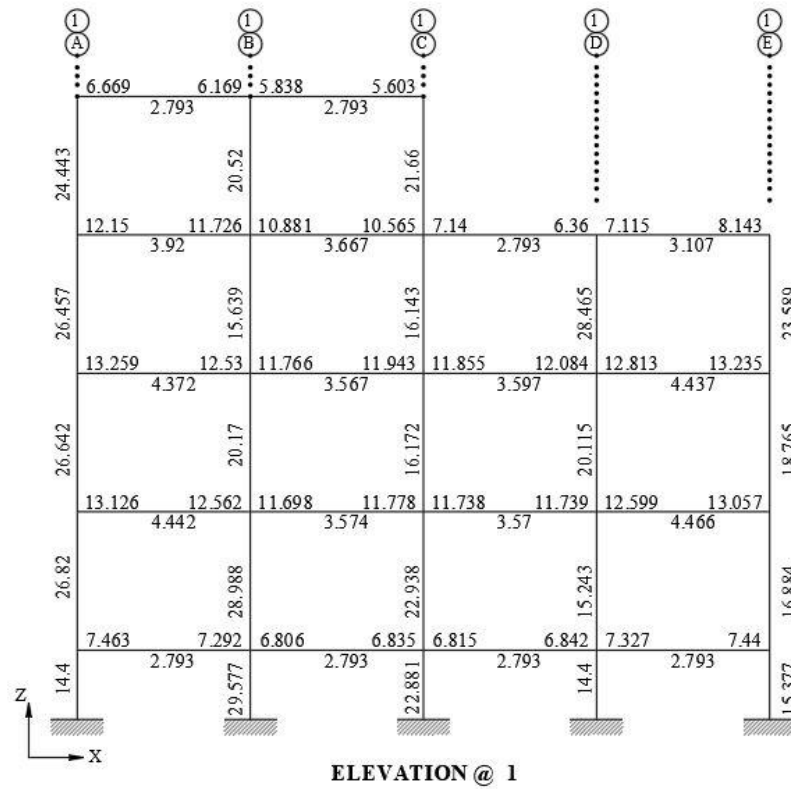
Reinforcement details for 4 storey building for grid -1
